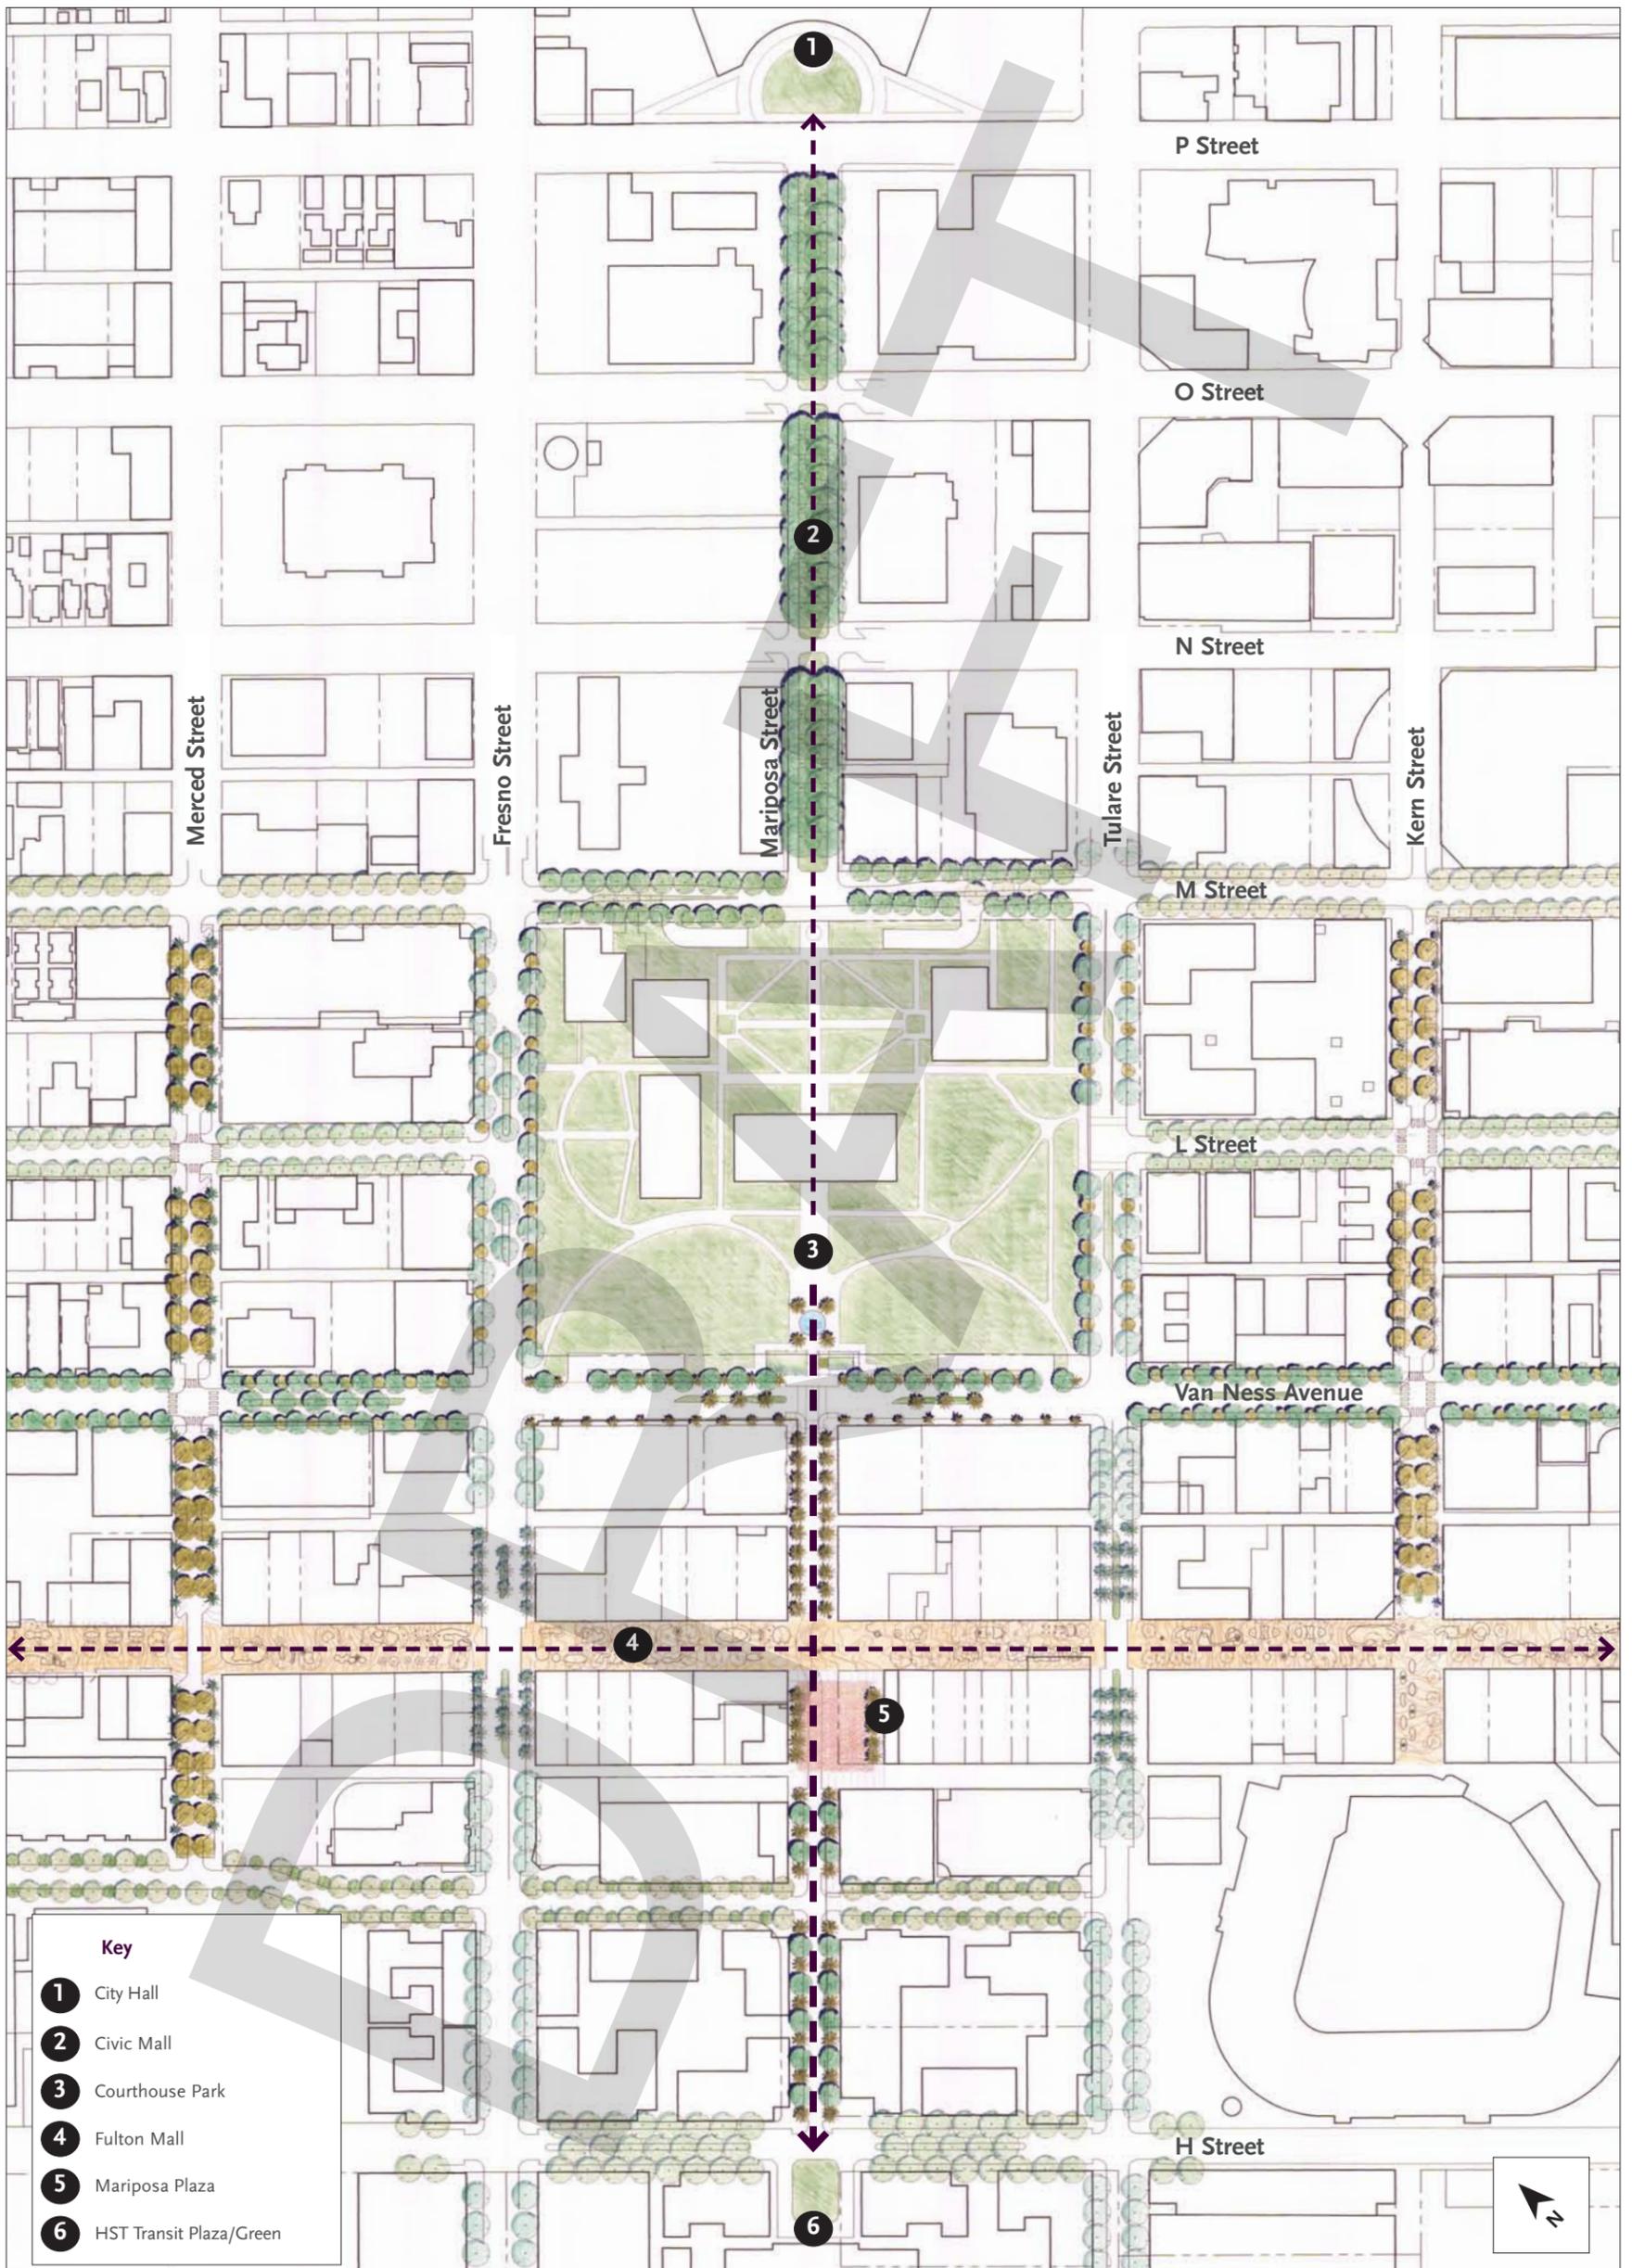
C - Public Realm Plan - Proposed streetscape plan for the Civic Mall, Courthouse Park, the HST Transit Plaza/Green and surrounding streets.
